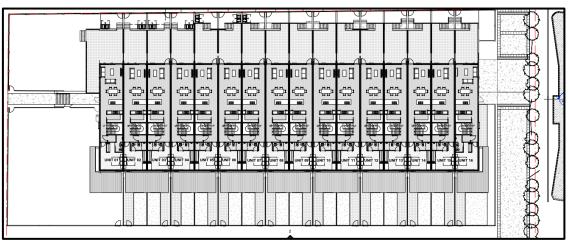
Floor Plan (Excerpt) - 1st Floor / Street level.
